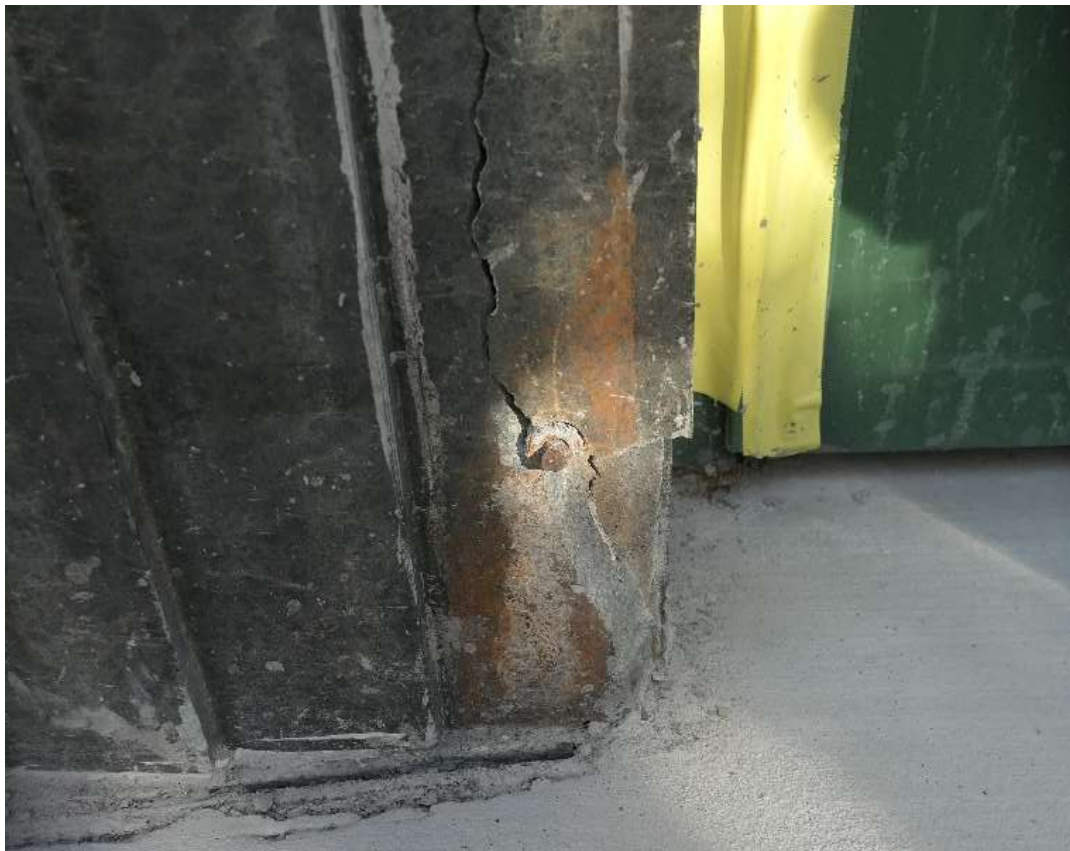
Missing granite chunk and crack – South Façade.
